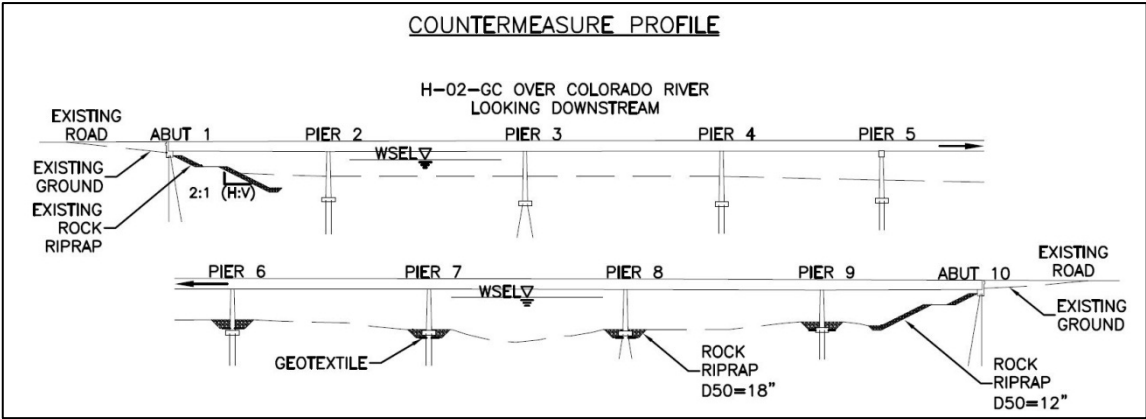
Cross-sectional view of Bridge H-02-GC with recommended hydraulic scour countermeasures
